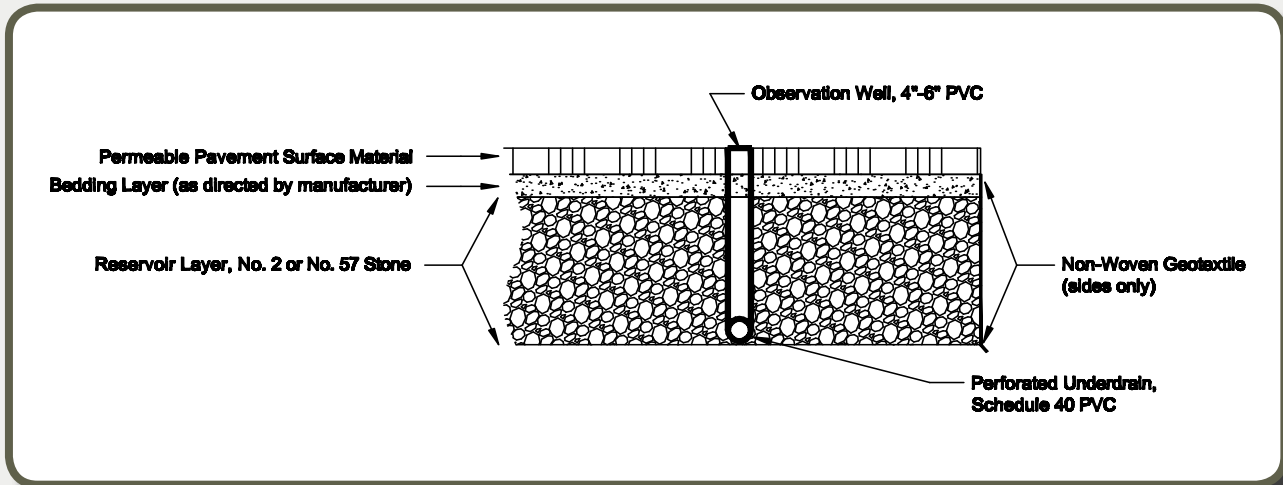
Cross Section of a Basic Level 1 Permeable Pavement Design
